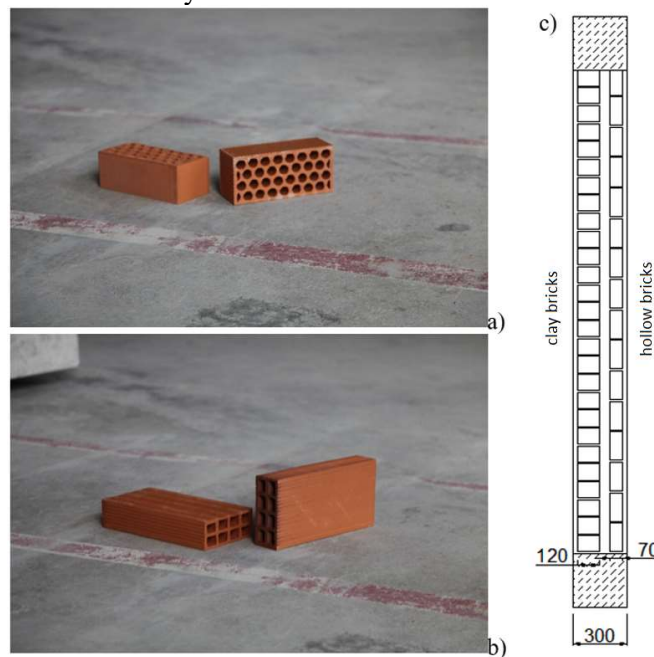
a) Clay masonry units, b) Hollow bricks, c) double-leaf wall in frame
